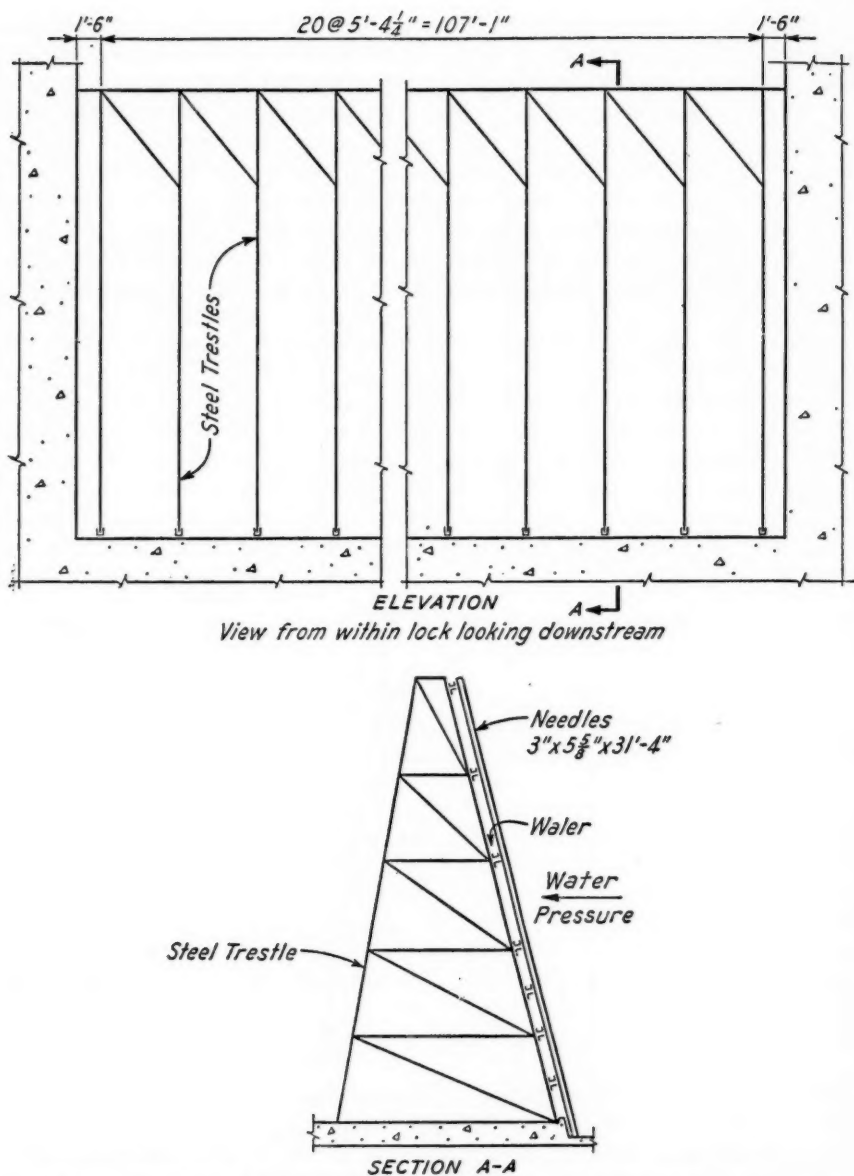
UNWATERING A DAM OF THE POIRÉE TYPE, BASED ON THE LOWER INSTALLATION, PICKWICK LANDING DAM ON THE TENNESSEE RIVER
